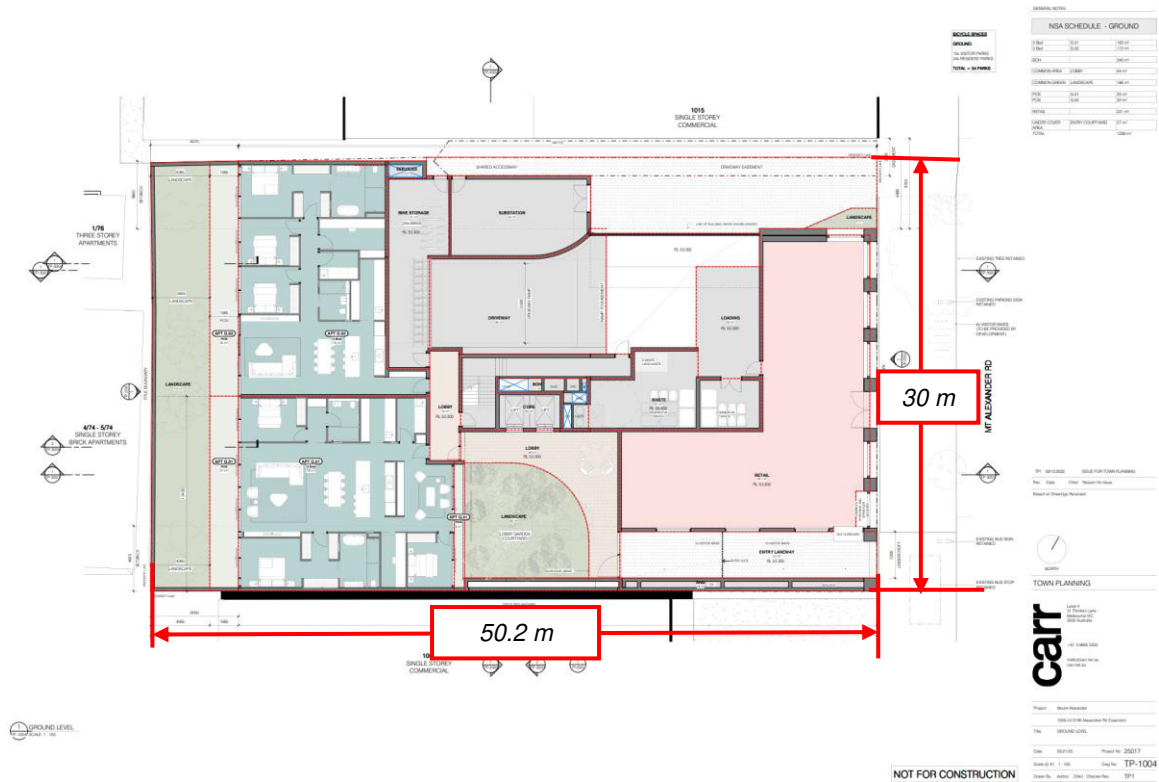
Ground floor plans with the plan-form dimensions overlaid.
